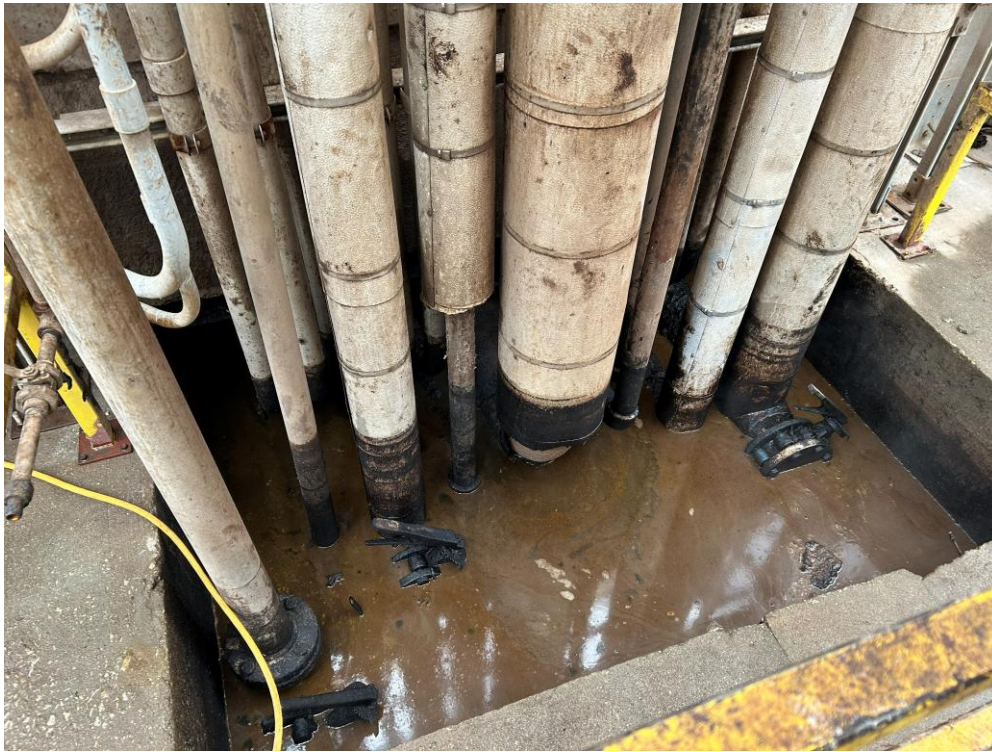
following these underground pipes inside concrete dome building containing evaporator system
